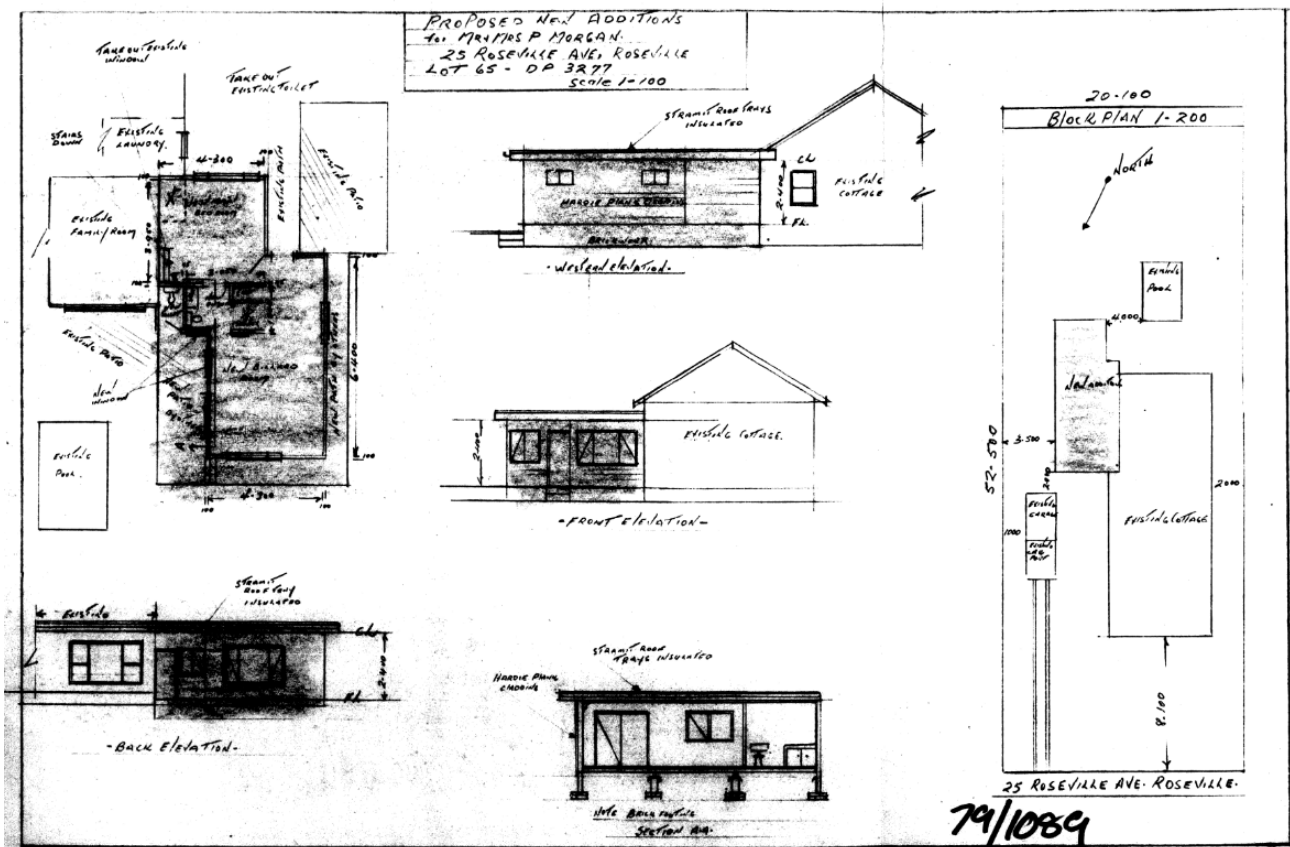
Proposed plans and elevations for construction of rear contemporary addition dating from 1979
